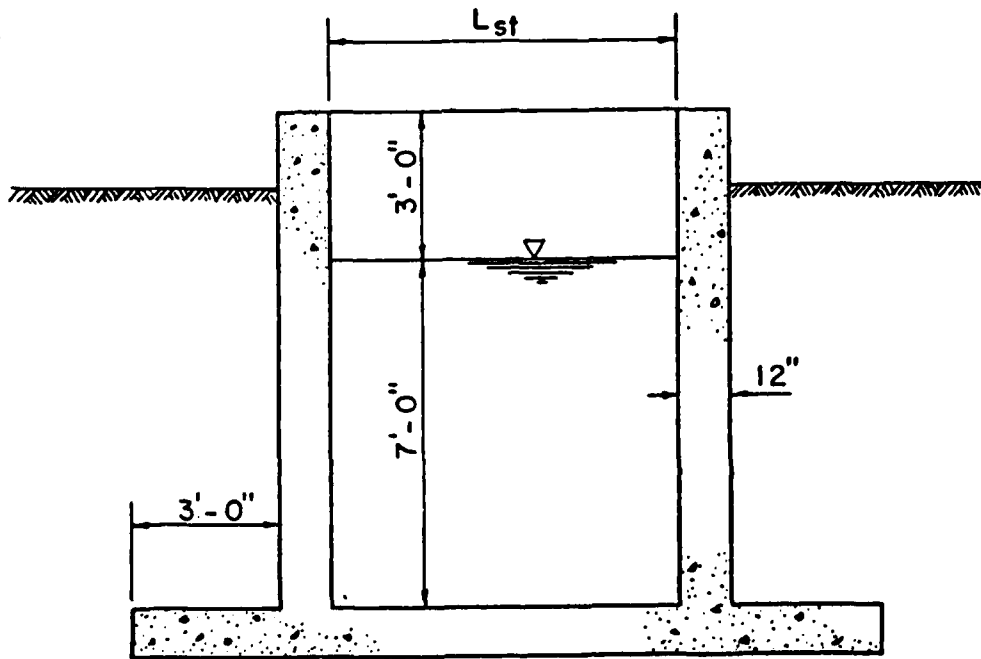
TYPICAL BACKWASH SURGE TANK
